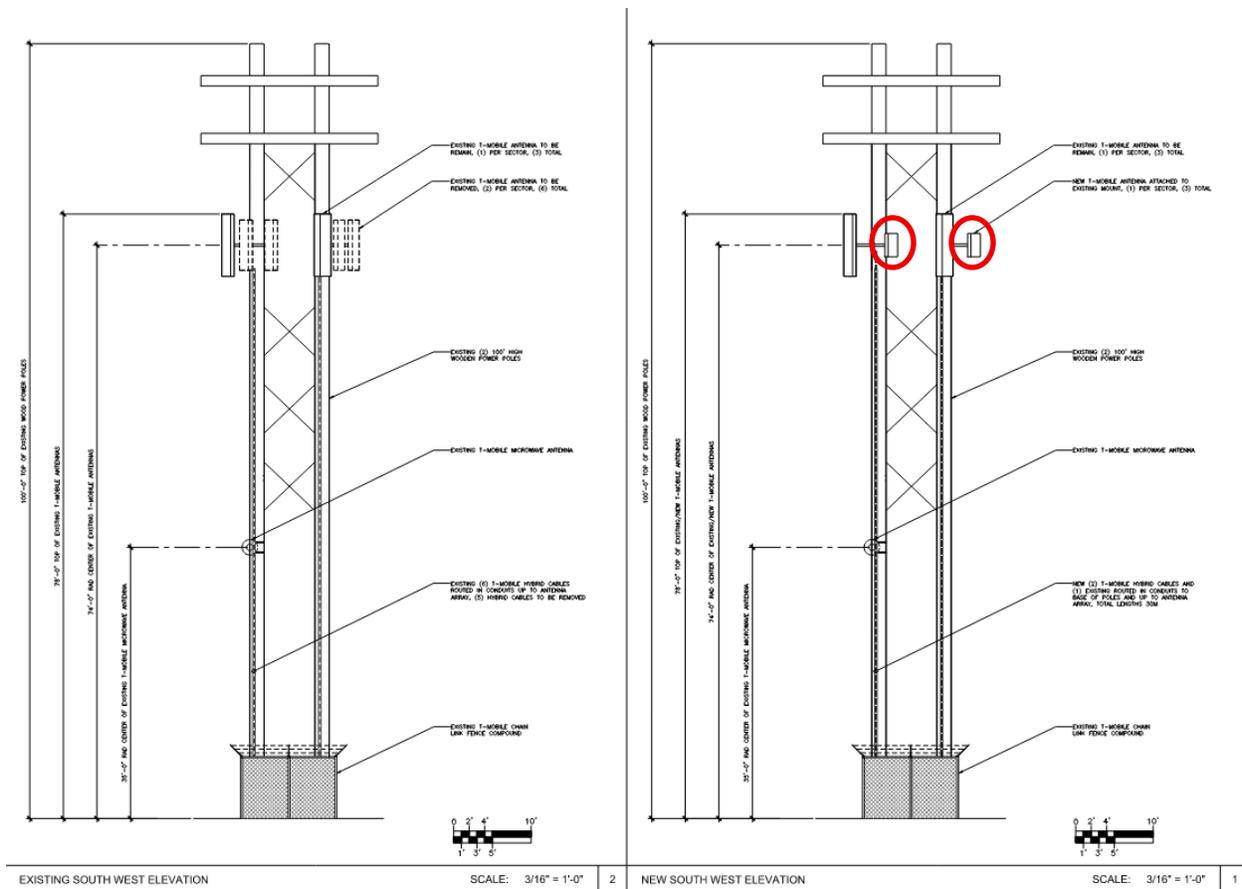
Existing and proposed elevations showing the equipment to be removed and replaced (outlined by staff in red). Taken from Applicant's Proposed Plans (Attachment 1).
